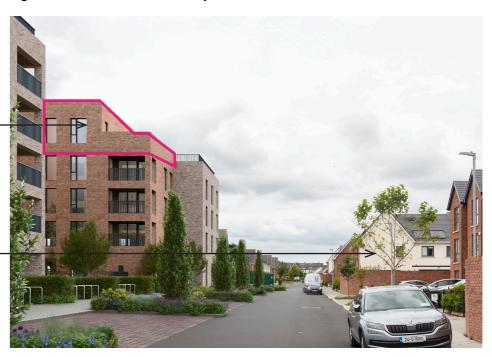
3D verified view of Block 6 along Belltree Avenue with facade of Unit 06-04-16,
